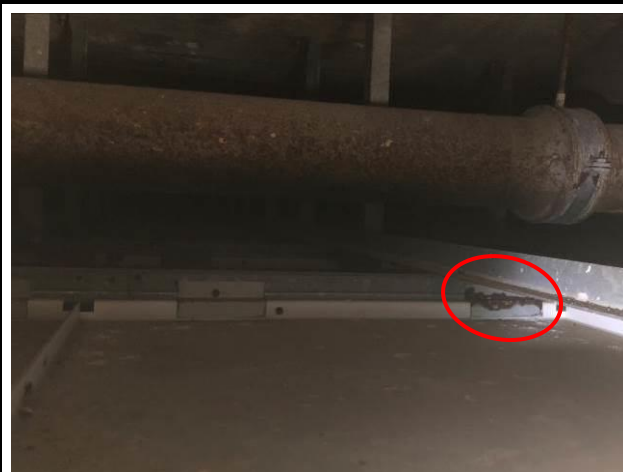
| Bracket connecting grid and ceiling panel was rusty.
